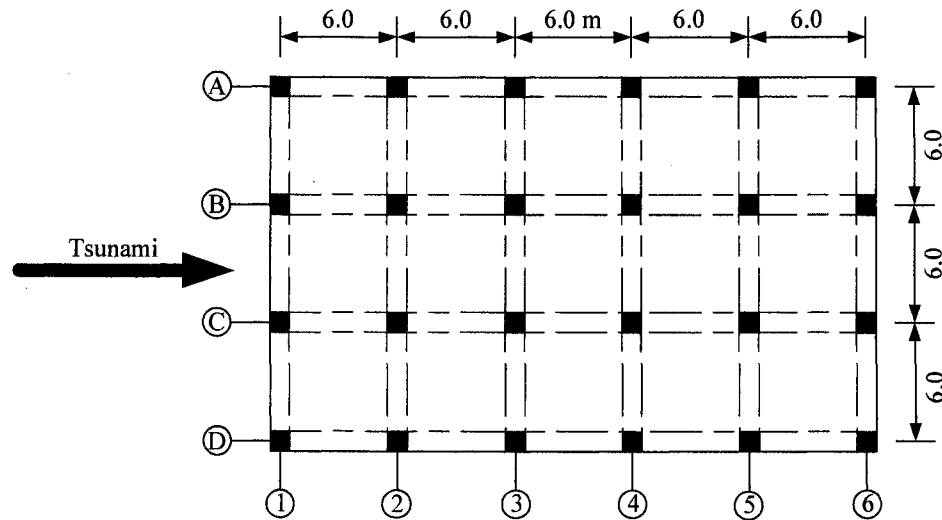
Plan view of structural layout of reinforced concrete moment-resisting frame.
